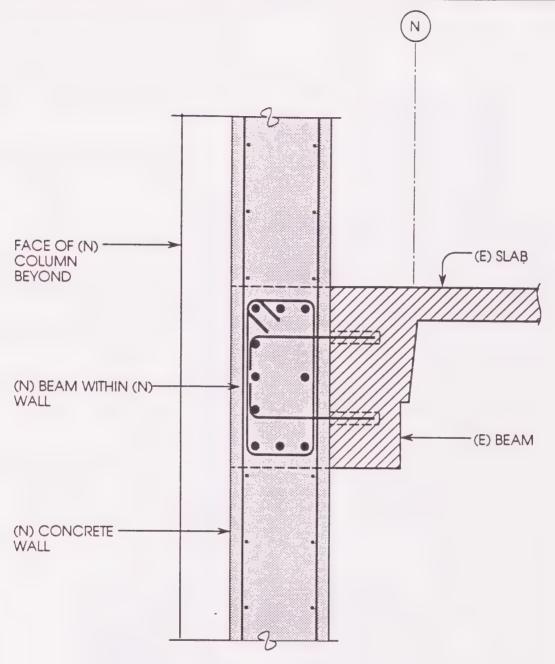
Retrofit Scheme - Typical Section Through Shotcreted Wall
